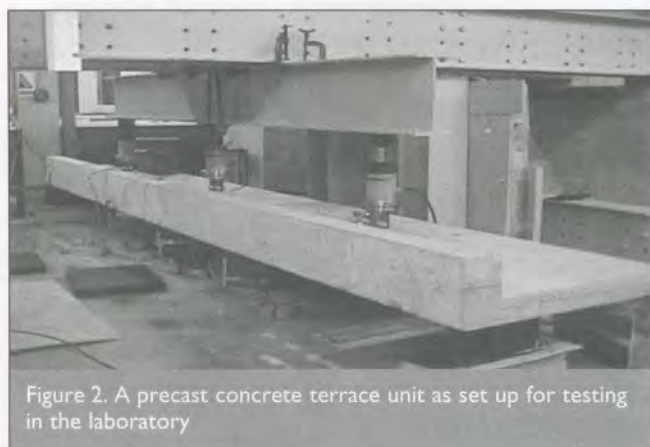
A precast concrete terrace unit as set up for testing in the laboratory
